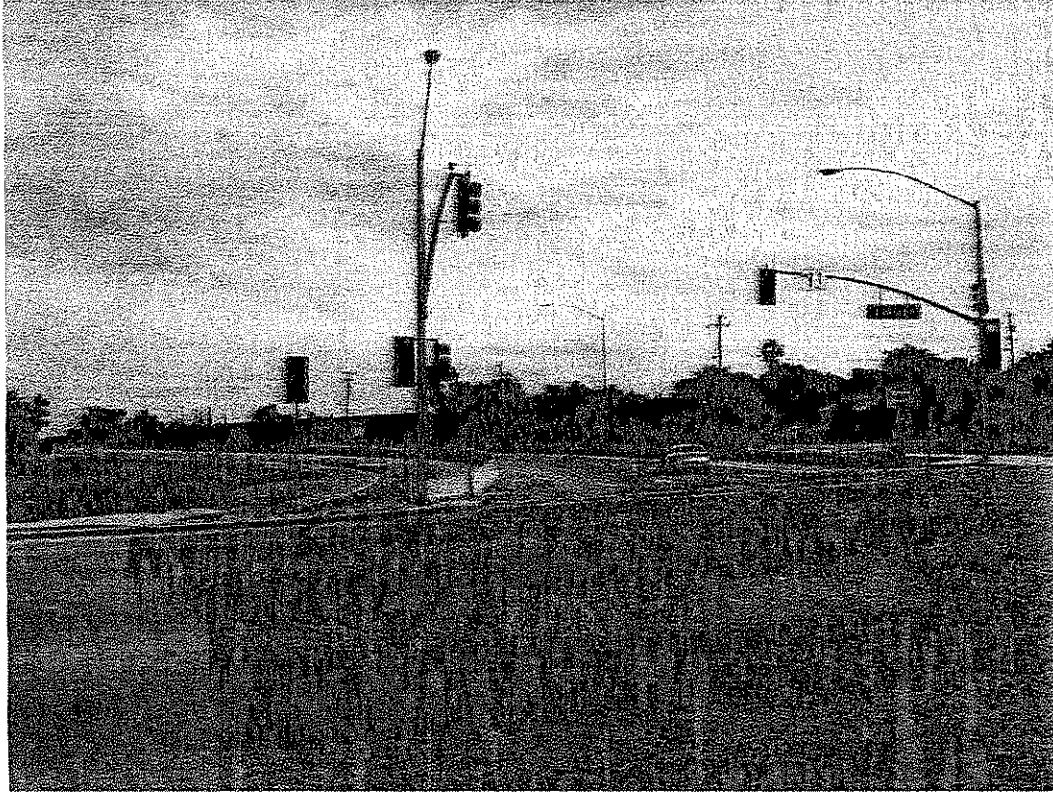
Looking across Bailey Road to the eastbound freeway ramps. A bicyclist or pedestrian traveling north along Bailey (which would be from right to left in this photo) must cross these two freeway ramps, first the on-ramp and then the off-ramp. Both ramps have vehicles making quick right-turns onto or off of the ramp. (All of the photographs in this grant application were taken between 12:15 p.m. and 1 p.m. on a weekday, when there isn't much traffic on the freeway ramps.)
